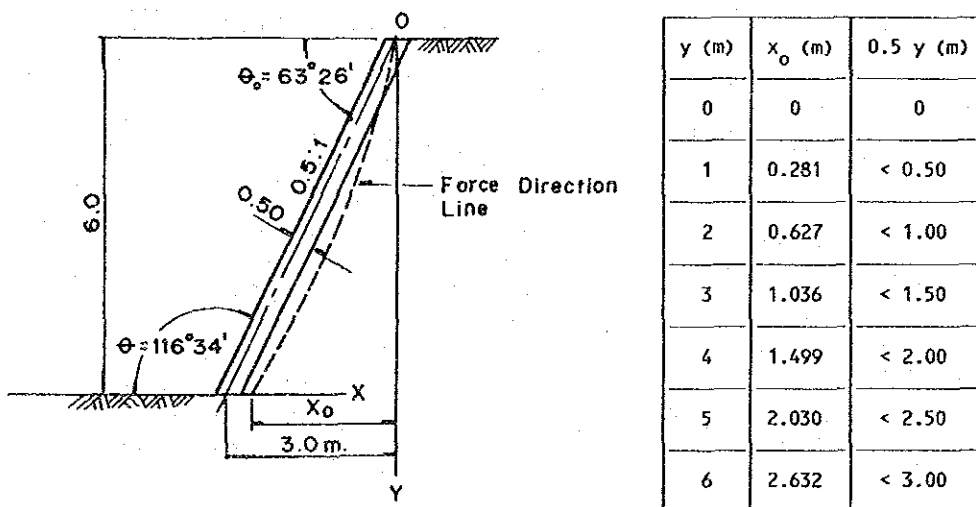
RIPRAP RETAINING WALL WITH 0.5:1 SLOPE
